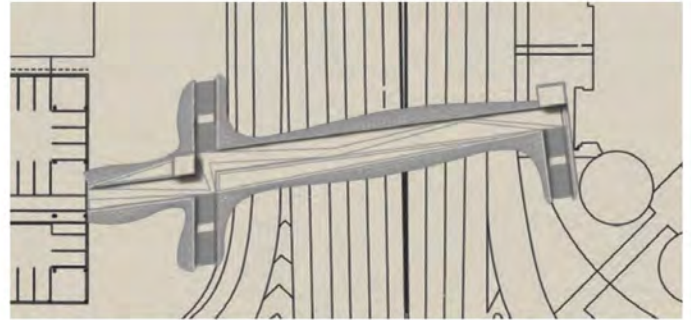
Plan view of Concept 3, the steel girder with architectural cladding option.
